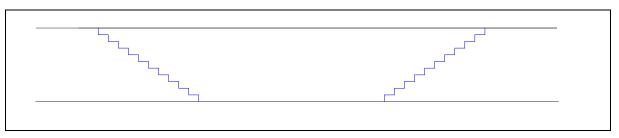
Step cutting for joining restored section and original construction (side view of embankment)
